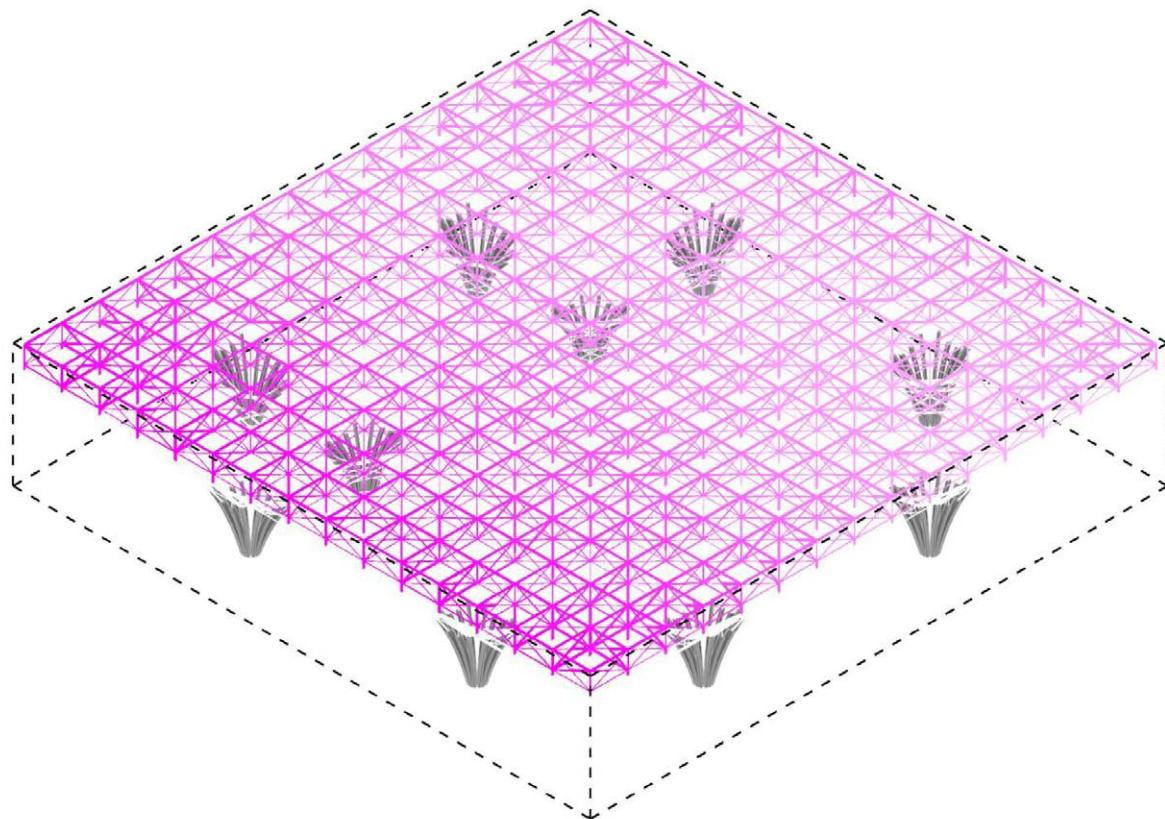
Diagram showing the deformation of a structural analysis performed of the space frame.
